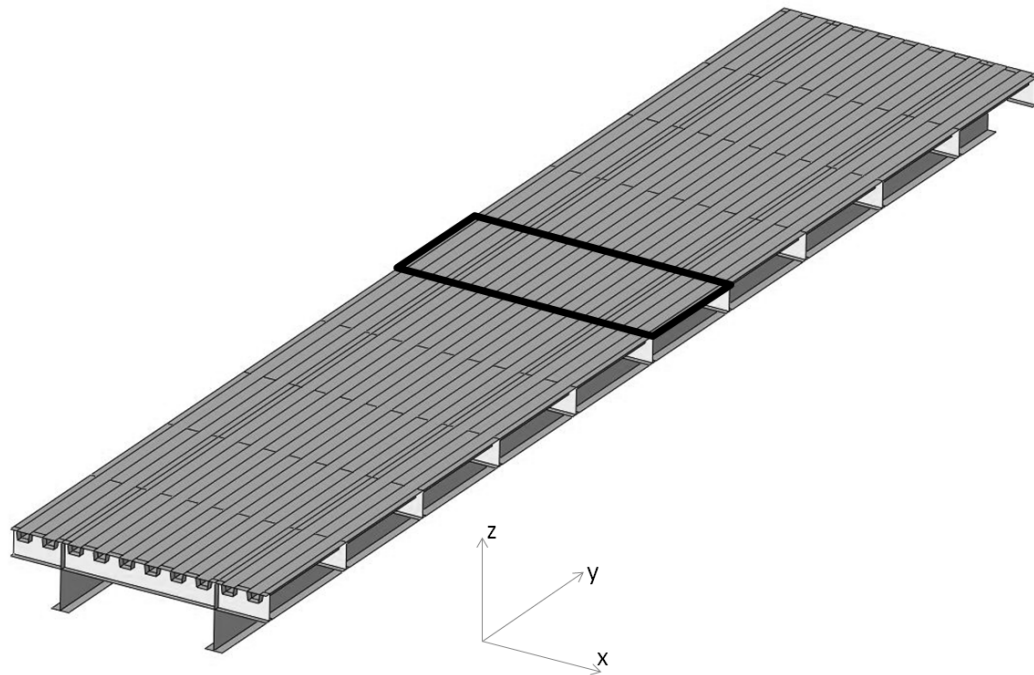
Bridge geometry in FE-model. The marked section is where the wheel loads are placed.
